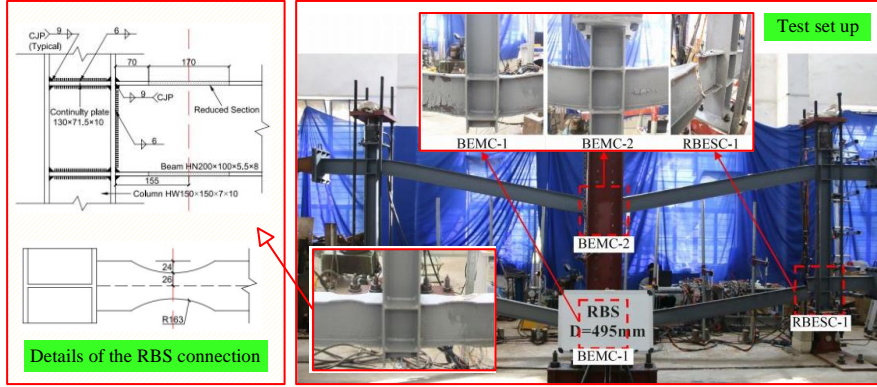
Collapse test of two-story steel frame with RBS connection [19] (dimension units: mm)
